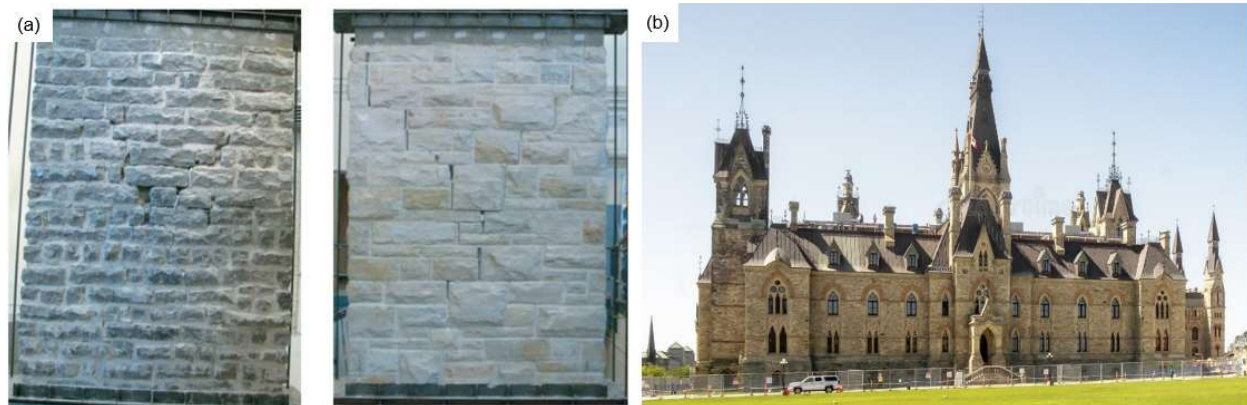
(a) Stepped cracks in stone masonry wall, typical of (b) West Block of Parliament, Ottawa (Elmenshawi et al. 2010a)
